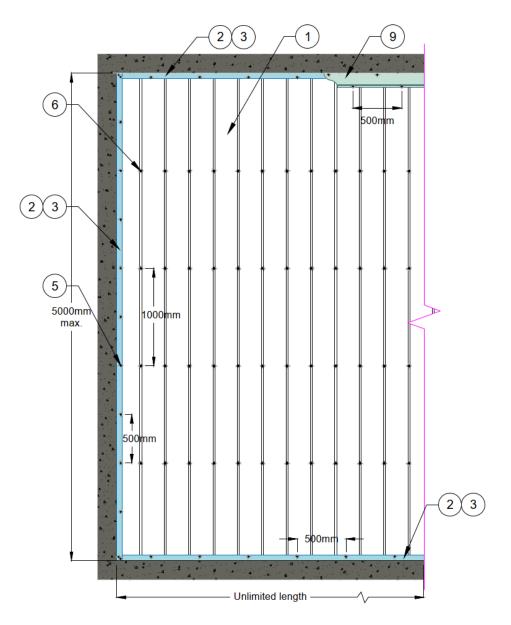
Elevation of vertical Speedpanel wall (up to 5 m high)
